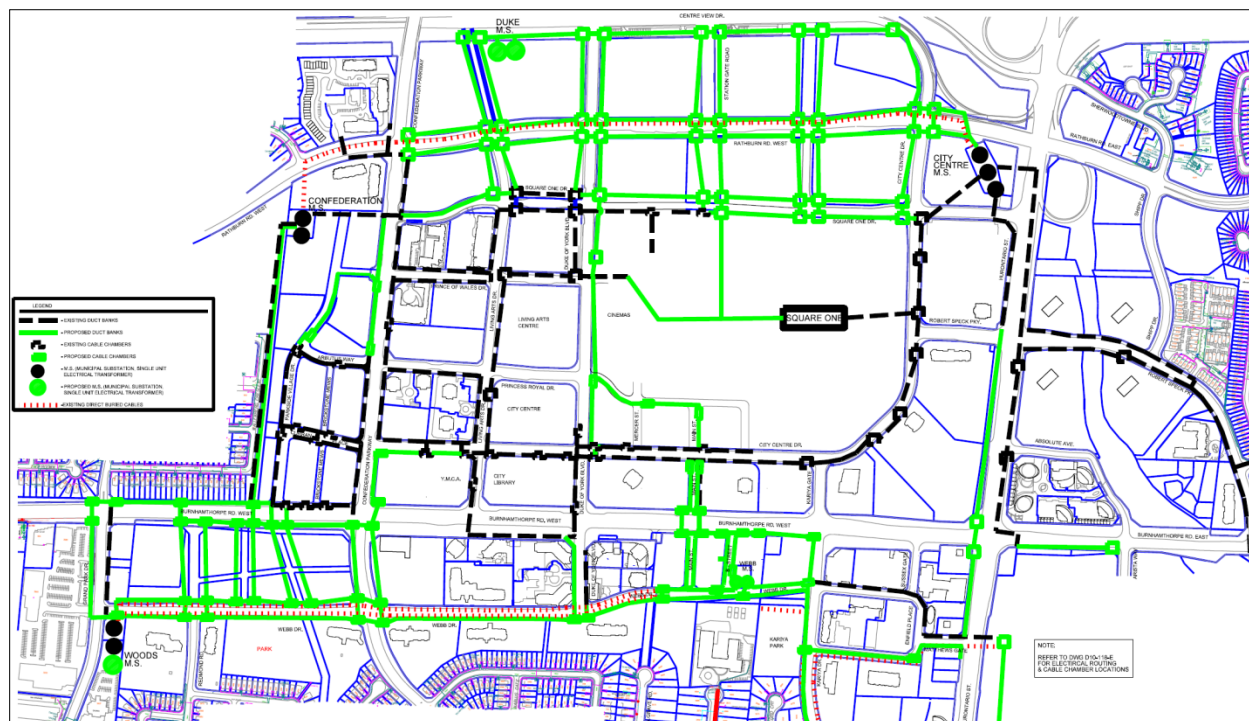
Existing and proposed underground distribution infrastructure in the Downtown Core.
